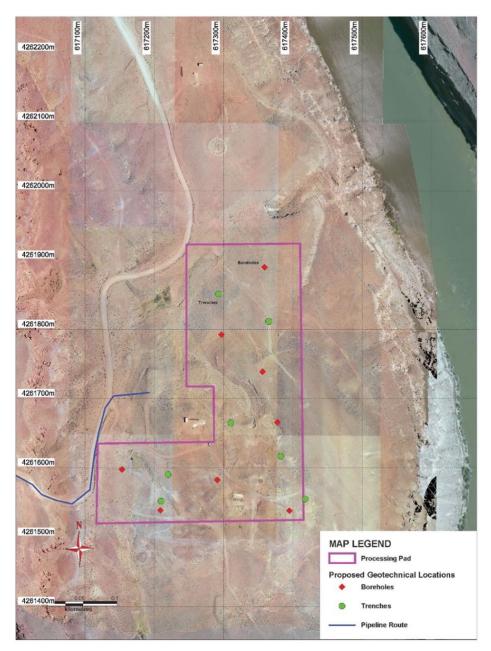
Plan showing the locations of the proposed boreholes and test trenches and Colorado River (right)
